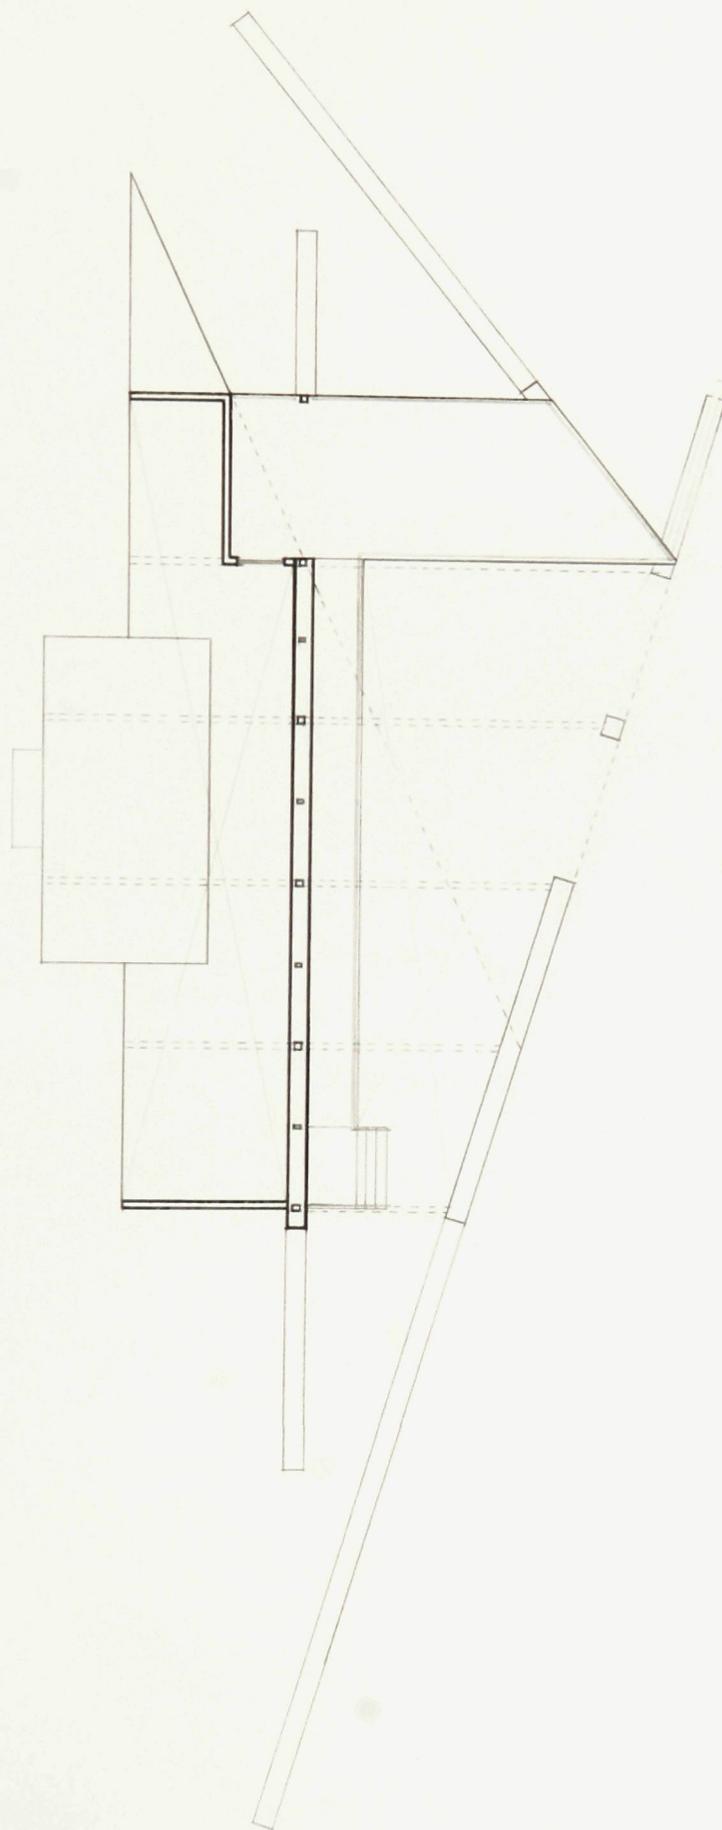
Pavilion: Second Floor Plan*, graphite, original 12" x 23" @ 1:100, 2008. Created by author.
